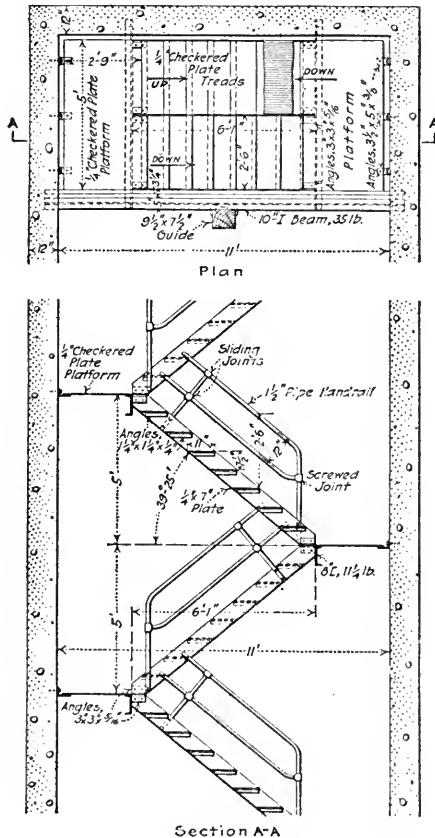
PLAN AND SECTION OF STAIRWAY.
